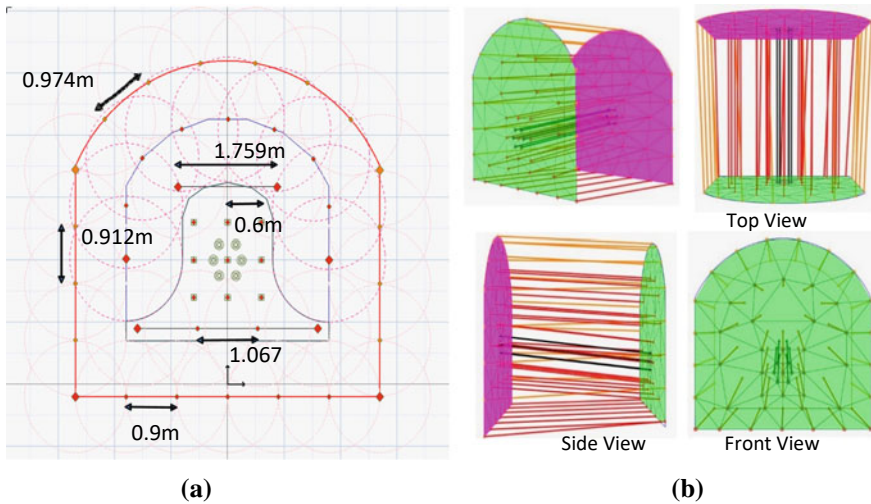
(a) First adjustment and reduction in drill holes 51 mm drill trial. (b) Three-dimensional modelling (top, side and front views), 37.3 m drill plan
